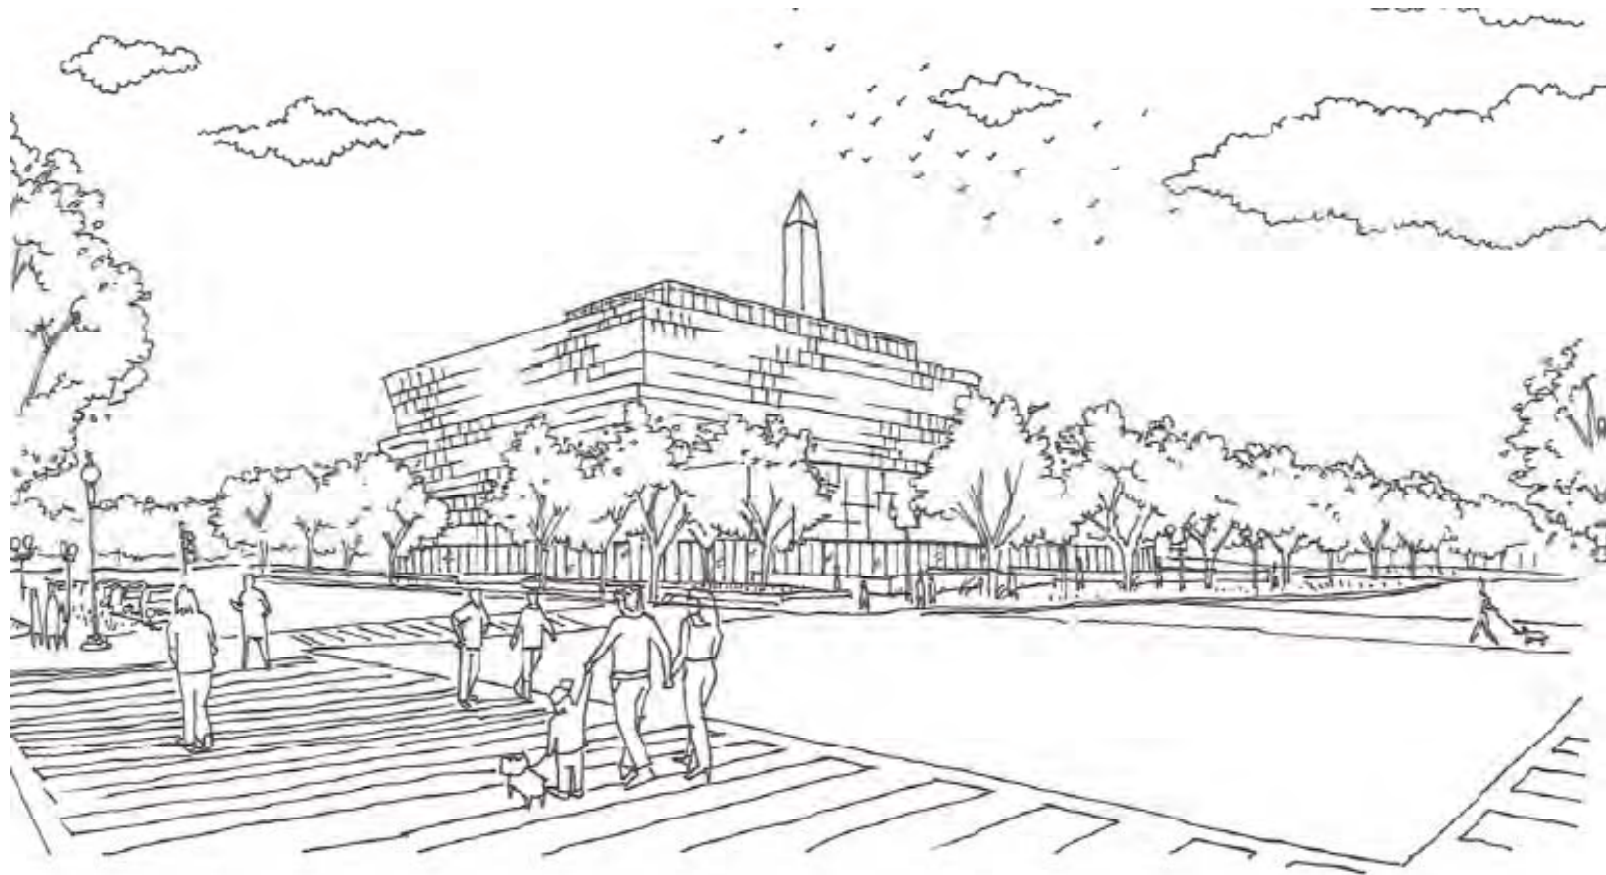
shows a sketch of the north (Constitution Avenue side) portion of the Plinth Alternative. Figure 2.3.2 shows cross-sections of the Plinth Alternative. Figure 2.3.3 shows the ground floor plan
